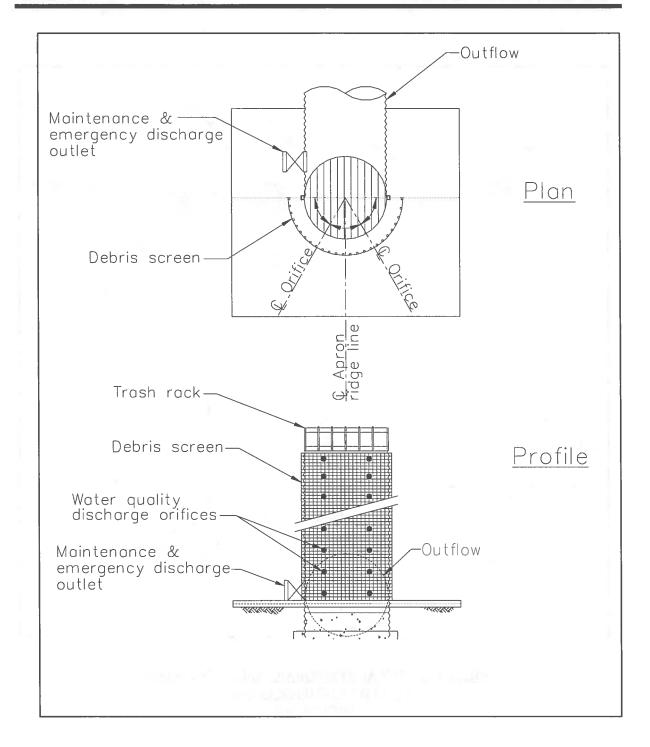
MULTIPLE ORIFICE OUTLET RISER NOT TO SCALE
